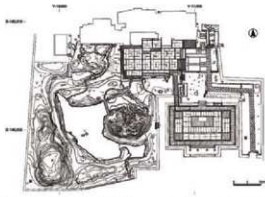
Site plan of Hokeiji's garden (surveyed in 2017).
